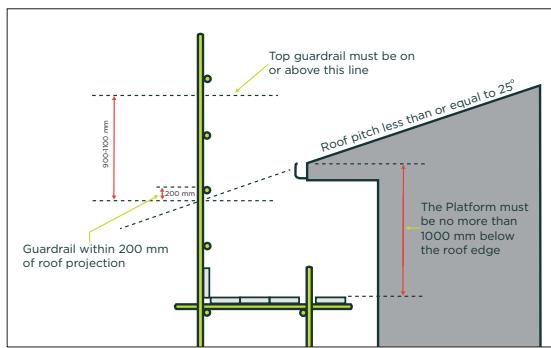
Roof edge protection for a roof pitch less than or equal to 25 degrees
